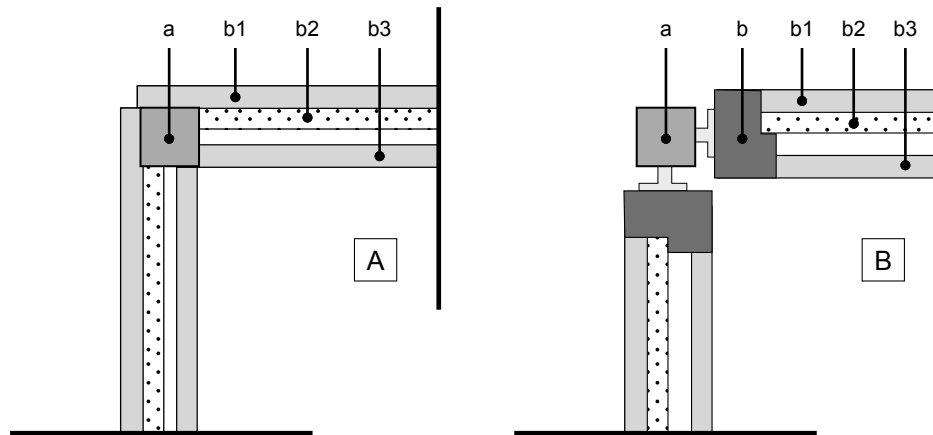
Wall section A is not designed for deconstruction. Wall section B is designed for deconstruction (Durmisevic and Brouwer, 2002)
